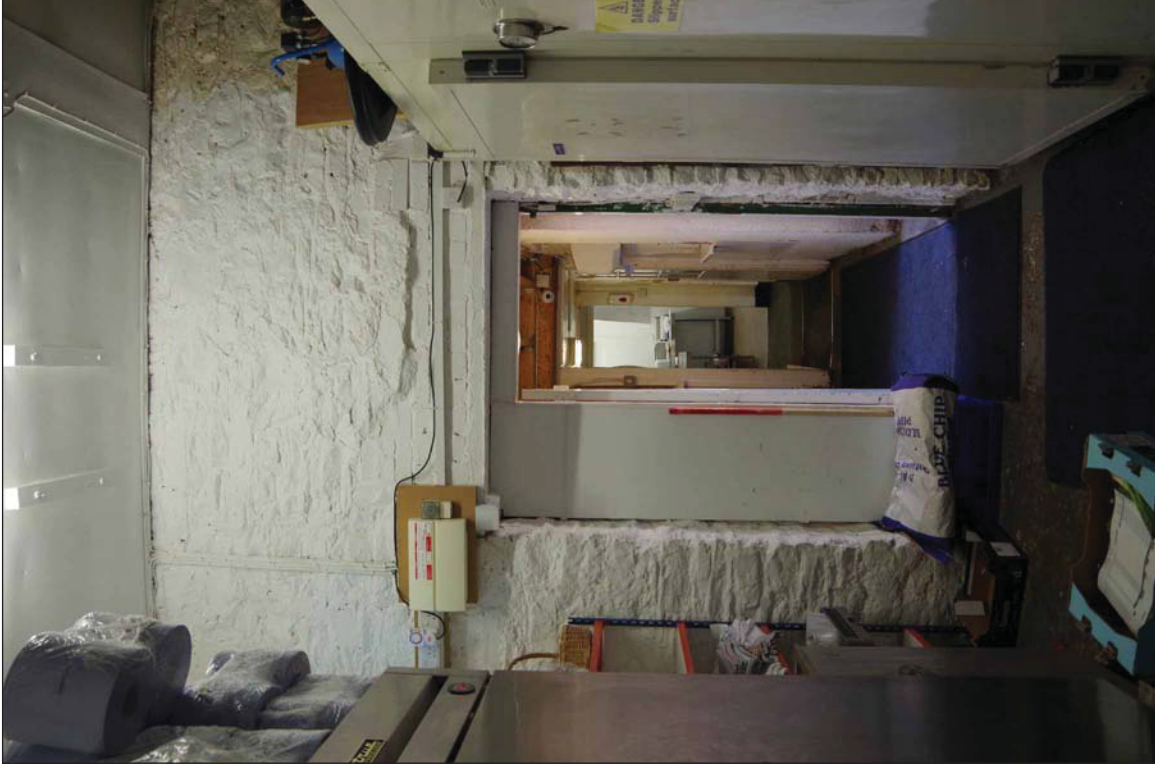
The northwest wall of the rear extension showing the break in stone masonry to the left of the door viewed from the southeast
